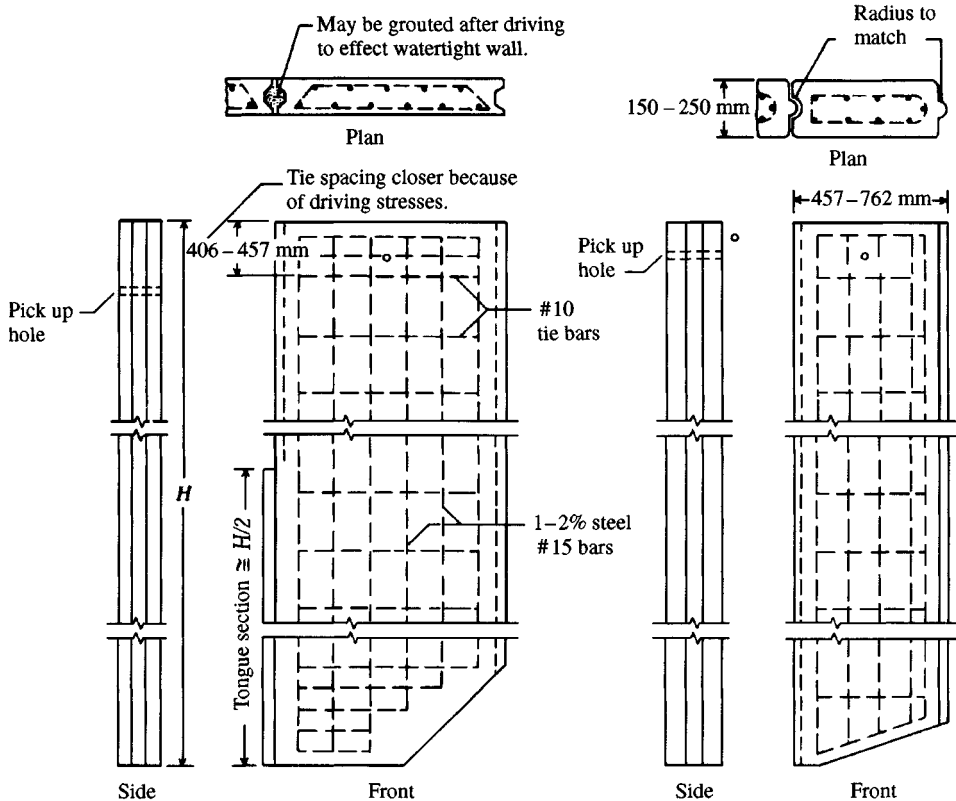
Typical details of reinforced concrete sheet piles. [After PCA (1951).]
